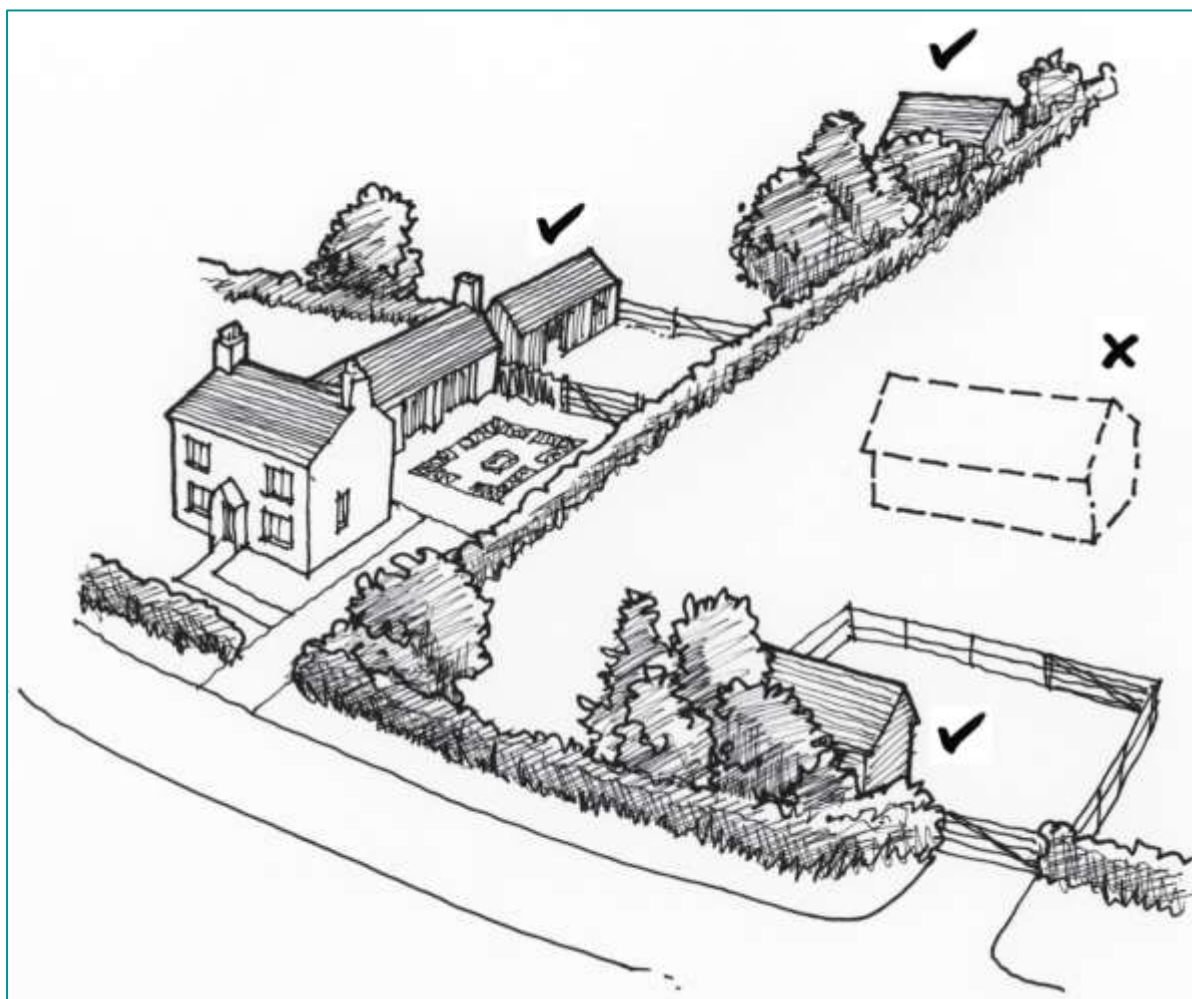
Good and poor examples of siting new equestrian buildings.
